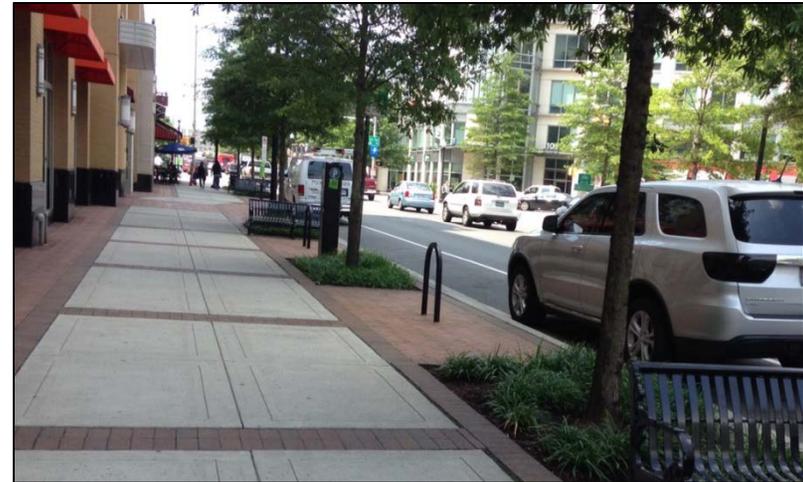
Brick banding surrounds concrete panels to create a decorative sidewalk and can be used to transition the streetscape design from all brick in commercial areas to all concrete in residential areas.
